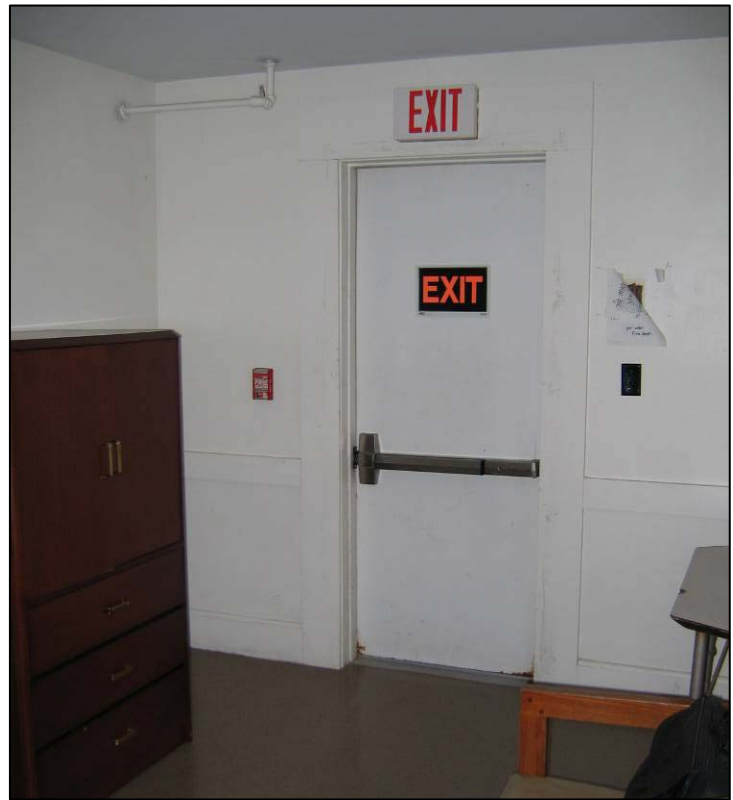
Room 205 (crew's bath) and doorway #2D.
